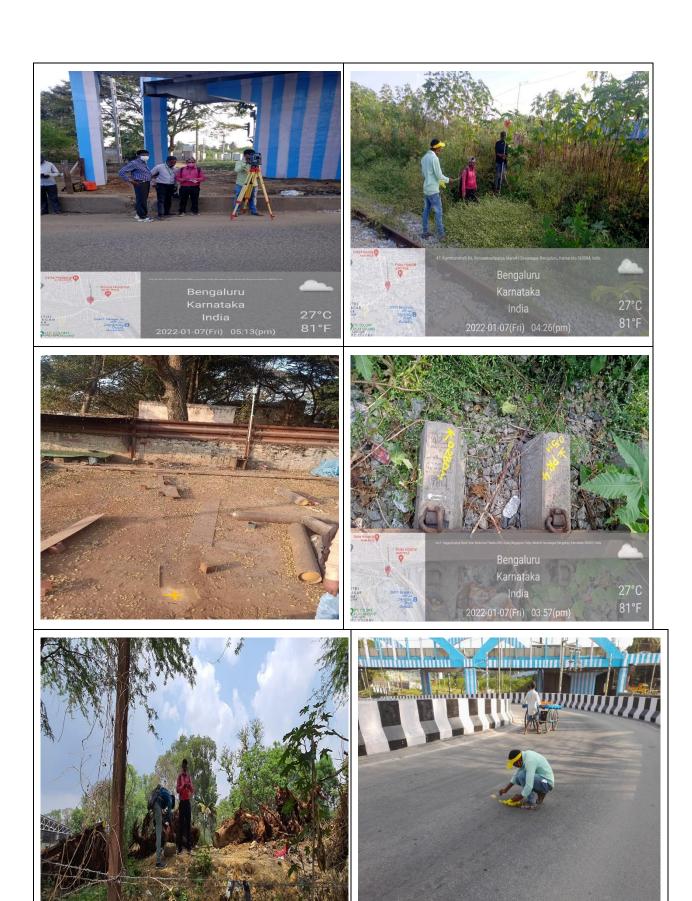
Survey for Fixing the Pier Locations at Elevated Rotary Junction
